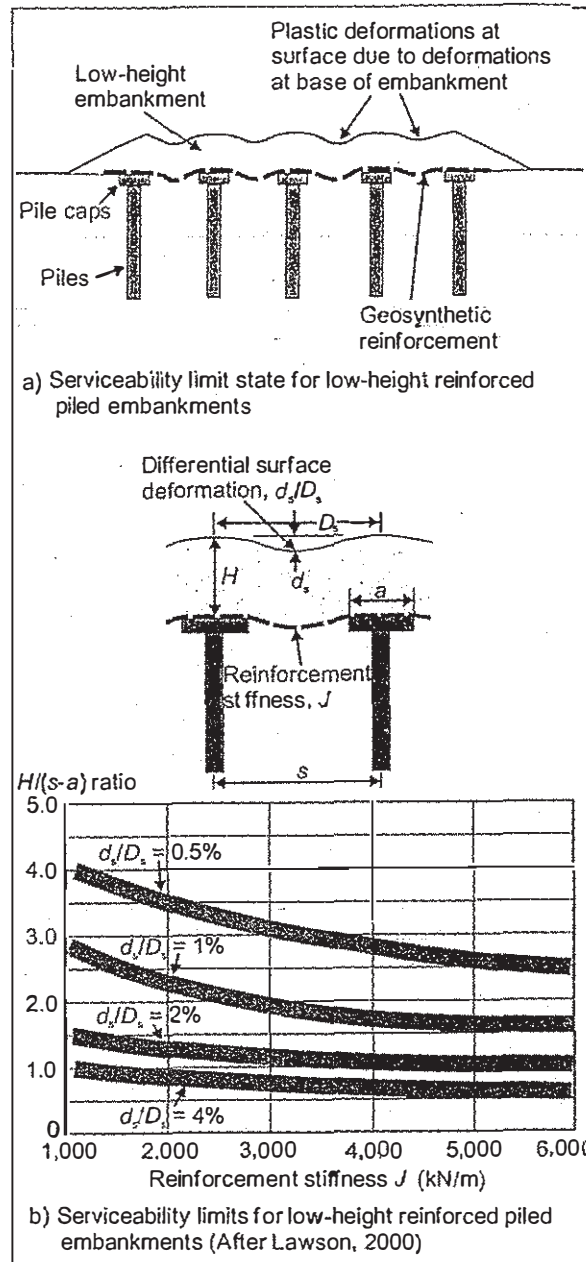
Serviceability limits for low-height reinforced piled embankments.
